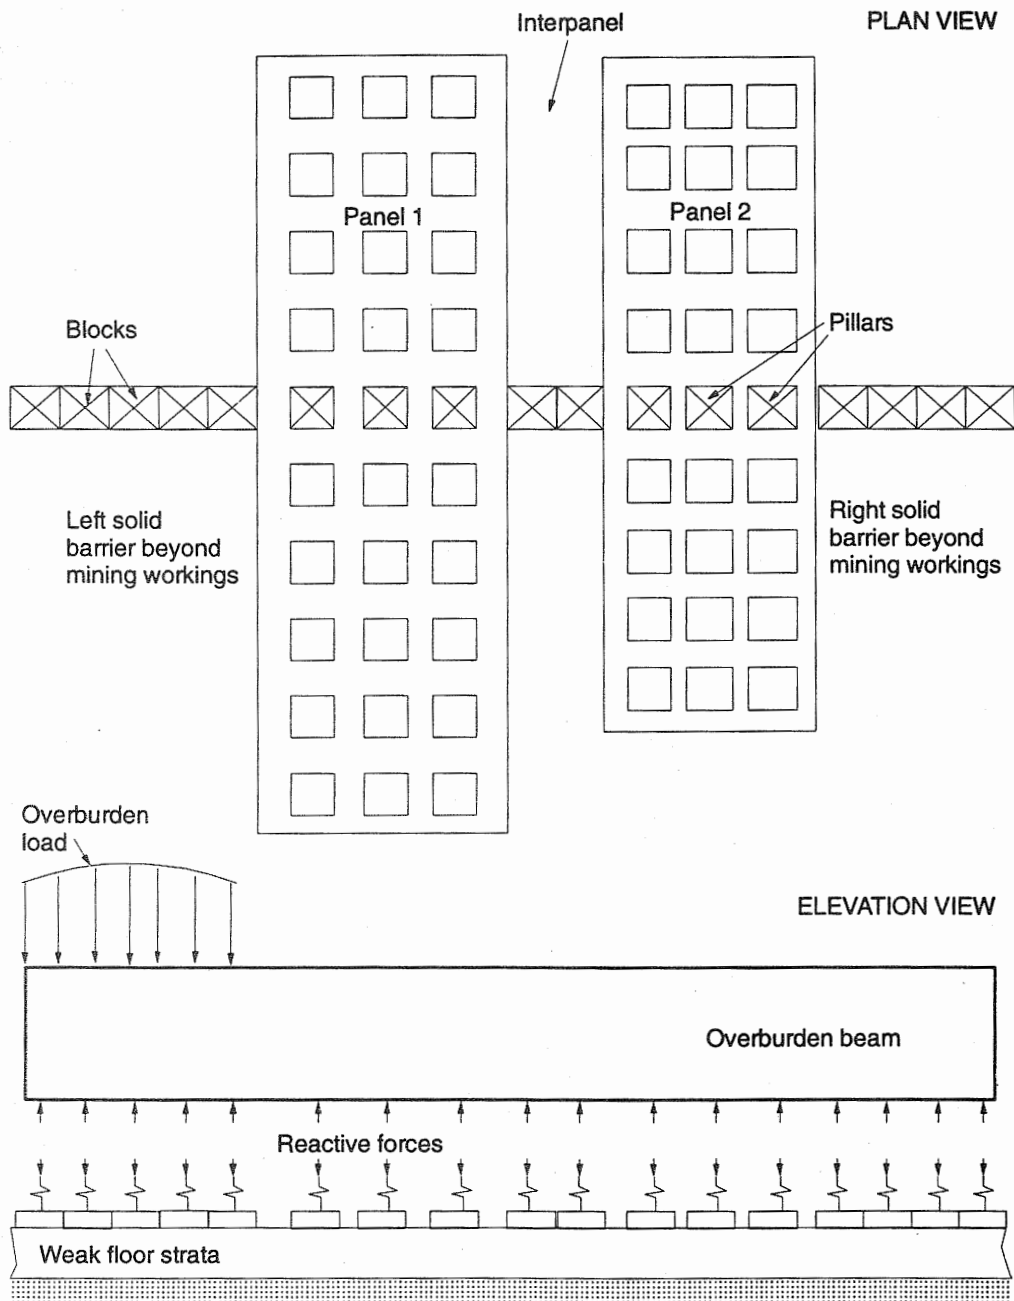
Overall problem with details of geometry and forces, showing plan and elevation cross-sectional views.
